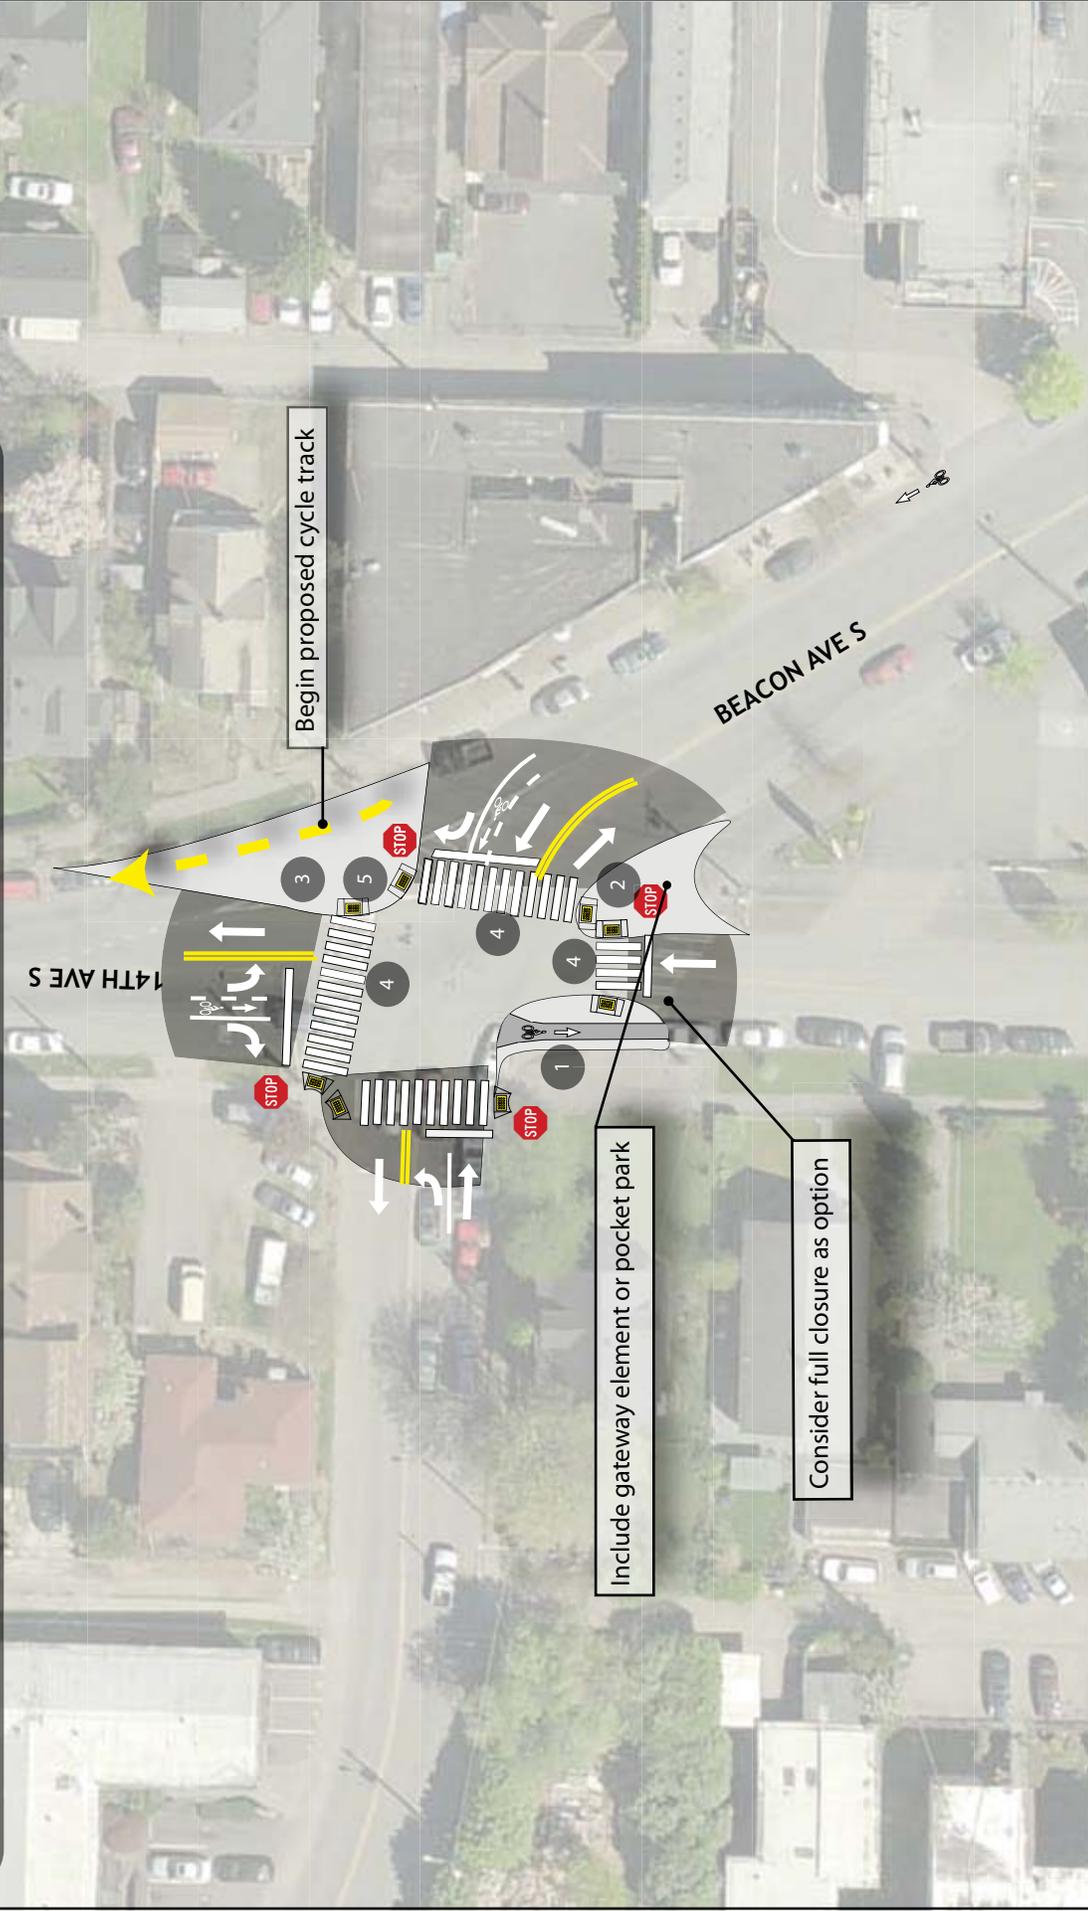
Beacon Avenue South and 14th Avenue South Conceptual Improvements
